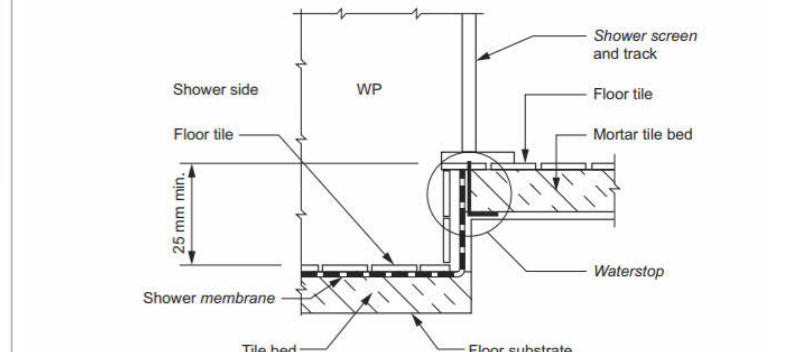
Typical unenclosed stepped down shower construction (membrane below tile bed)
